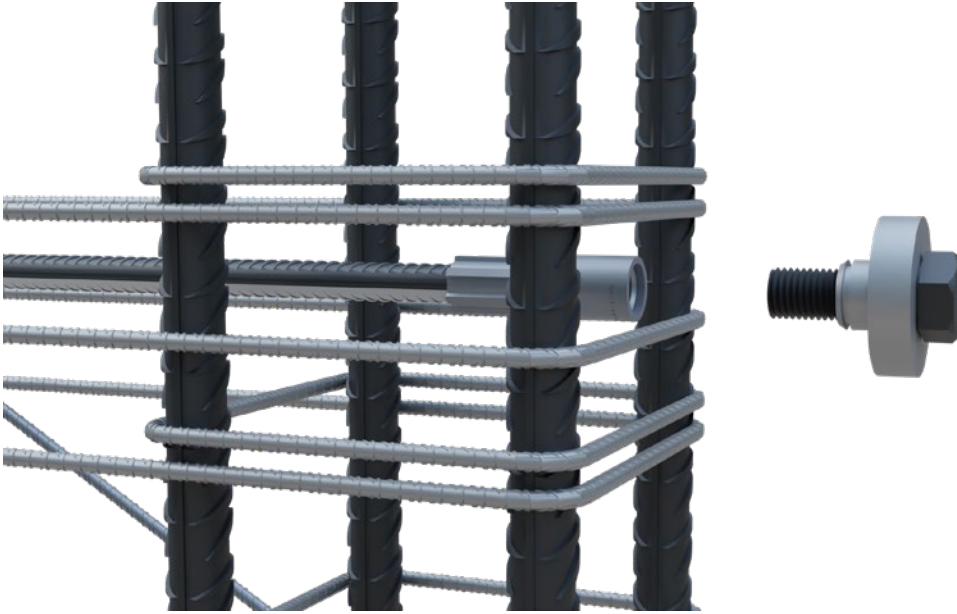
MODIX® EM HEADED ANCHOR'S BENEFIT OF REMOVABLE AND POST-INSTALLED HEAD IN HIGHLY REINFORCED CAGE
